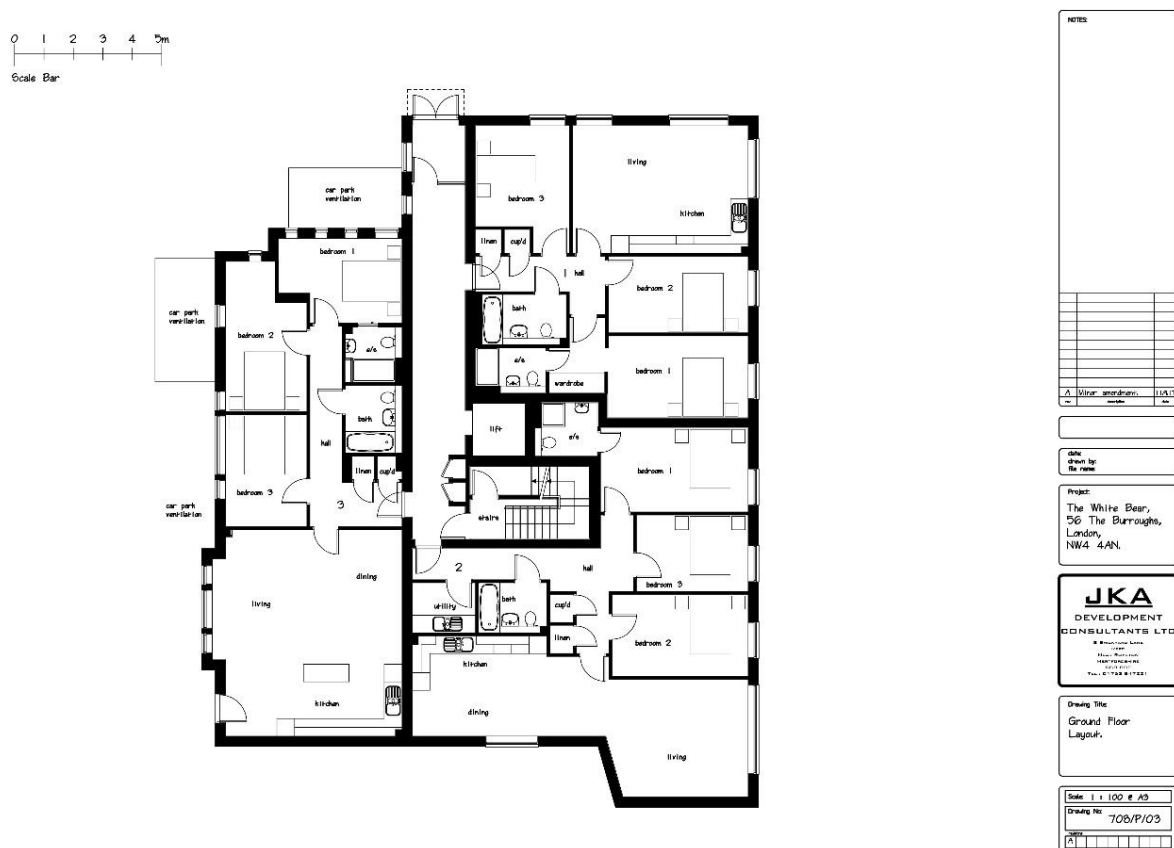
Ground floor layout plan (JKA Developments, Dwg. No. 708/P/03 Rev A, 11/09/2017)
